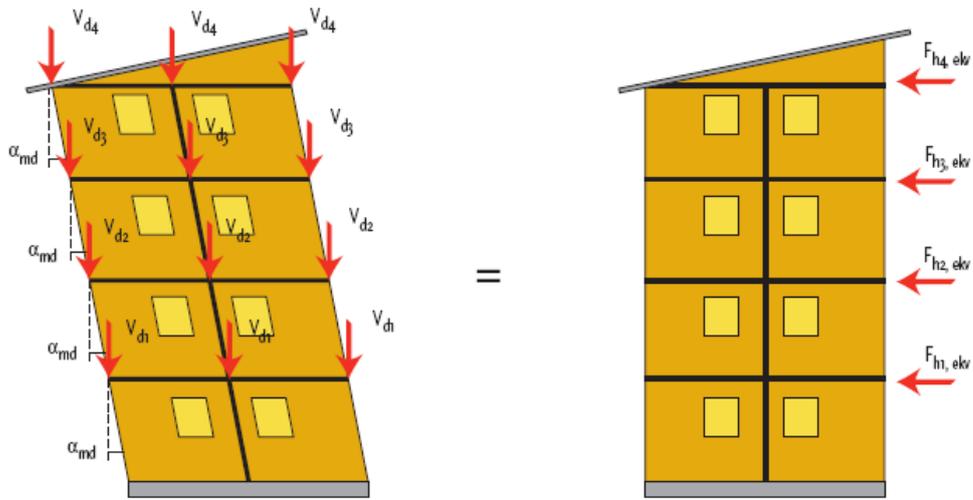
Equivalent horizontal forces on the floor structure due to misalignment of the bearing walls. (Massivträhandboken 2006)
